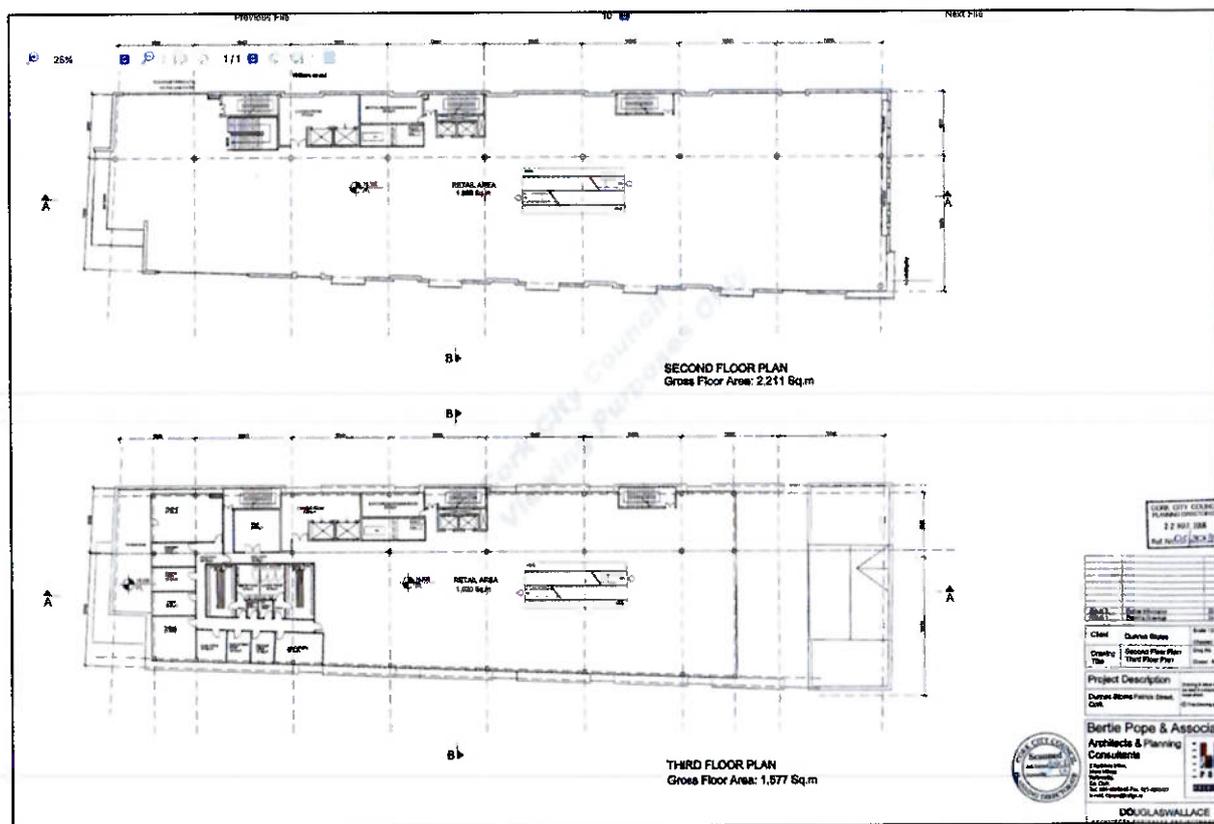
Floor Plan as submitted at RFI stage 22 May 2006.
